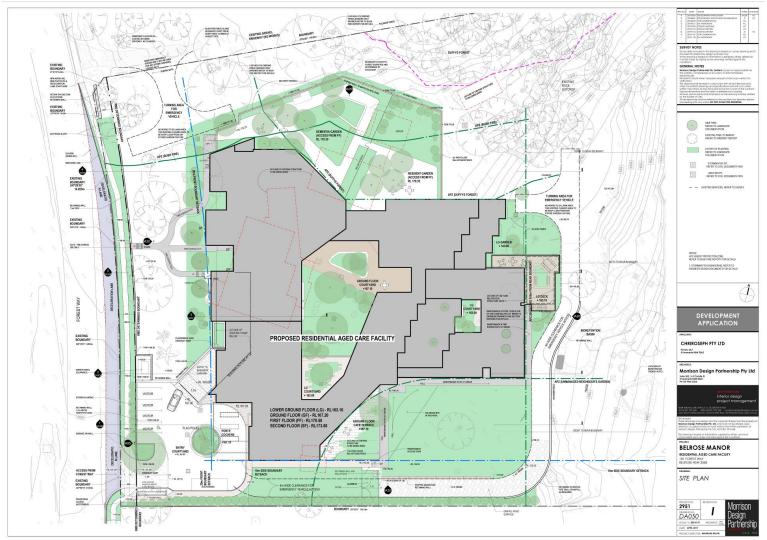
Current site plan (source: *Morrison Design Partnership*, revision I dated 18/11/2019)
